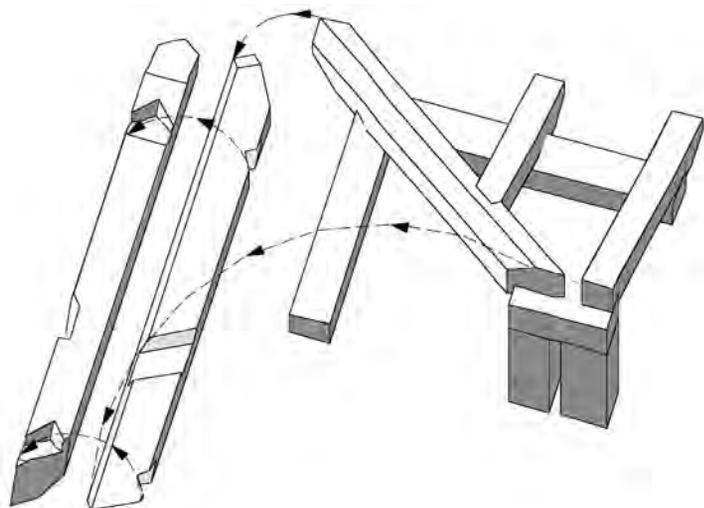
Perspective view of model hip folded to give developed drawing views shown in Fig. 21.
